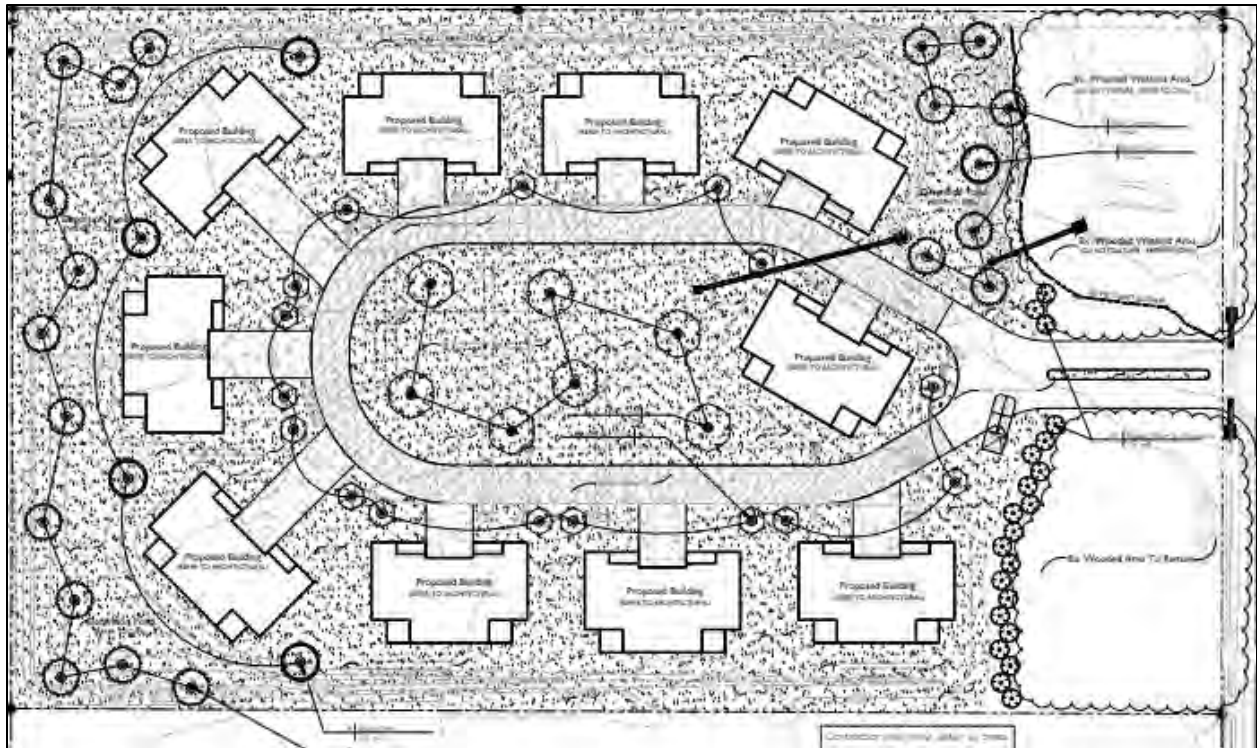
Tin Tops @ Gayfer SD.19.40 previously submitted Landscape Plan.
